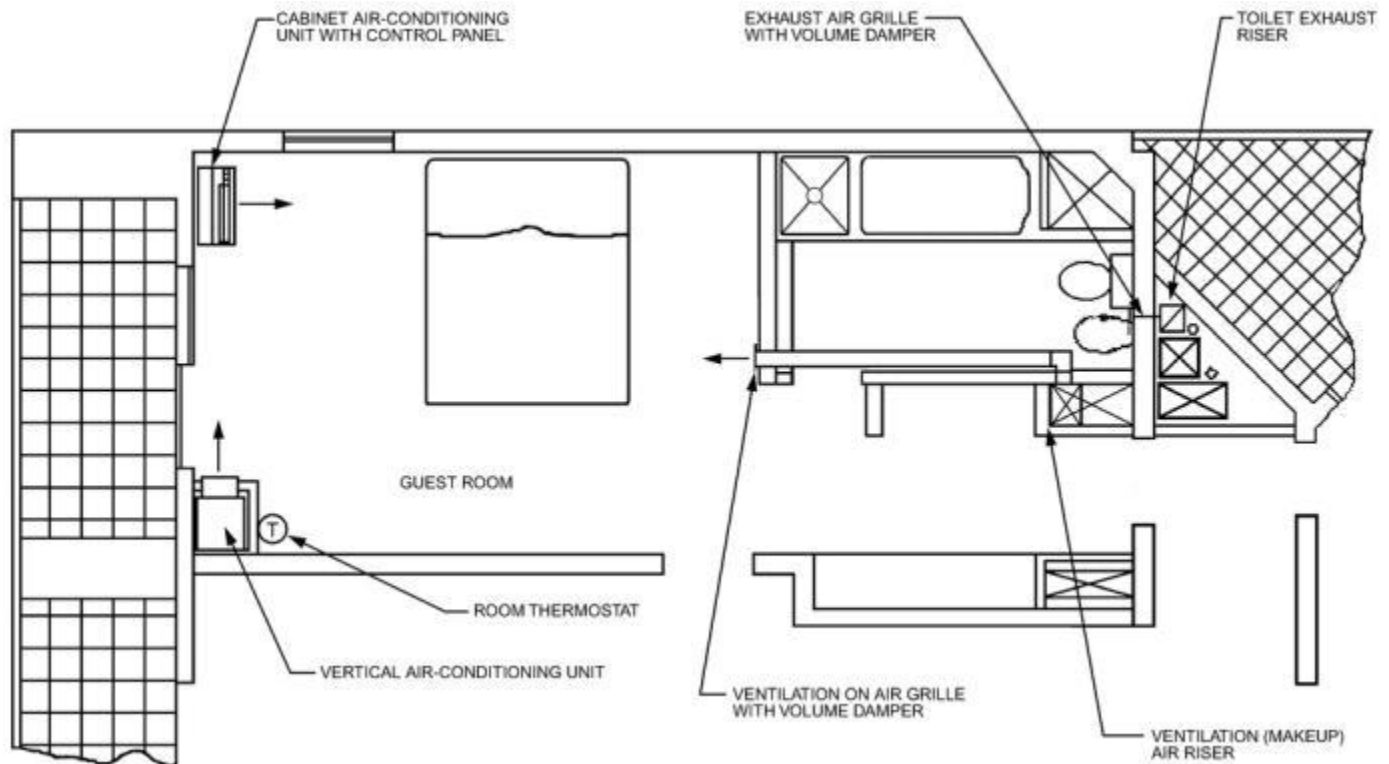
Alternative Location for Hotel Guest Room Air-Conditioning Unit on Room Perimeter and Chase-Enclosed
